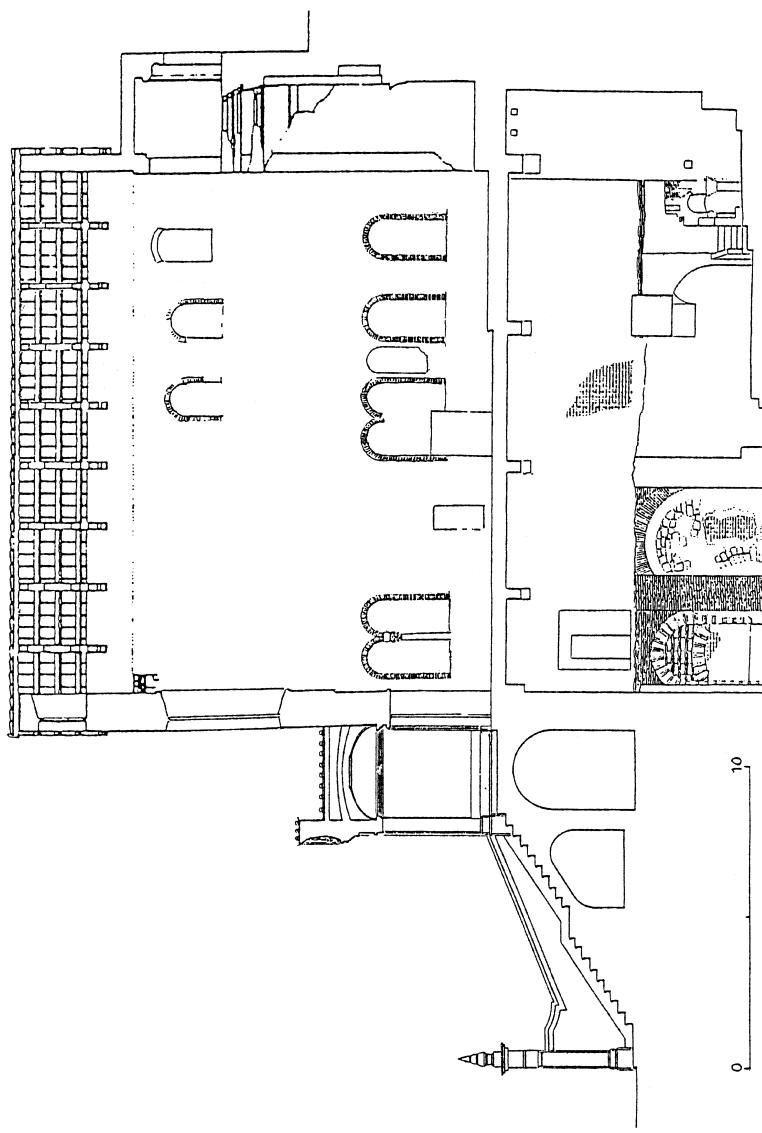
Salerno, S Pietro a Corte, section. Below street level are remains of Roman buildings. The major part of the walls belong to the building of Arechi II. (From Peduto, 'Chiesa di San Pietro a Corte', p. 22 (with slight changes).)
